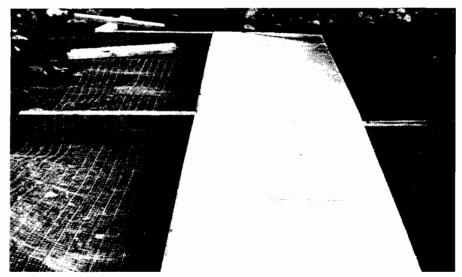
Rodent barrier constructed with metal aboveground and woven wire to extend 3 feet belowground when installed. Wire at the bottom will be bent to form a "J."
